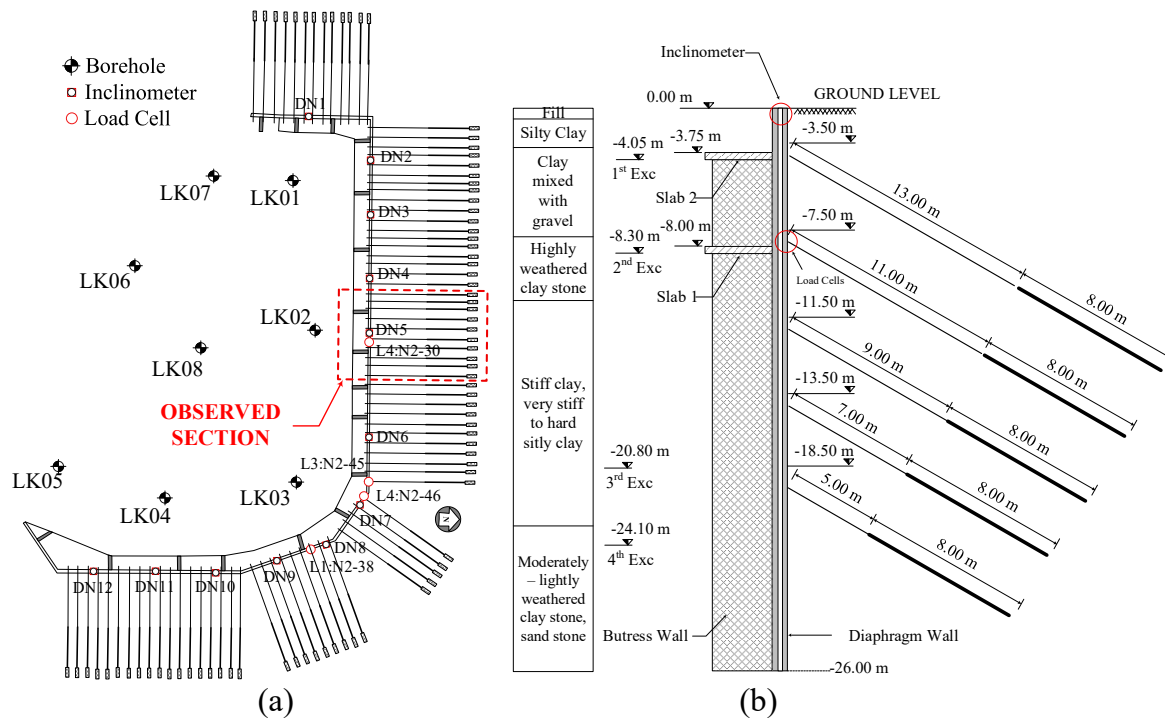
Excavation profile of the Vietnam excavation case: (a) Layout of the installed instrumentations and observed section; (b) Cross-sectional excavation profile and ground condition
